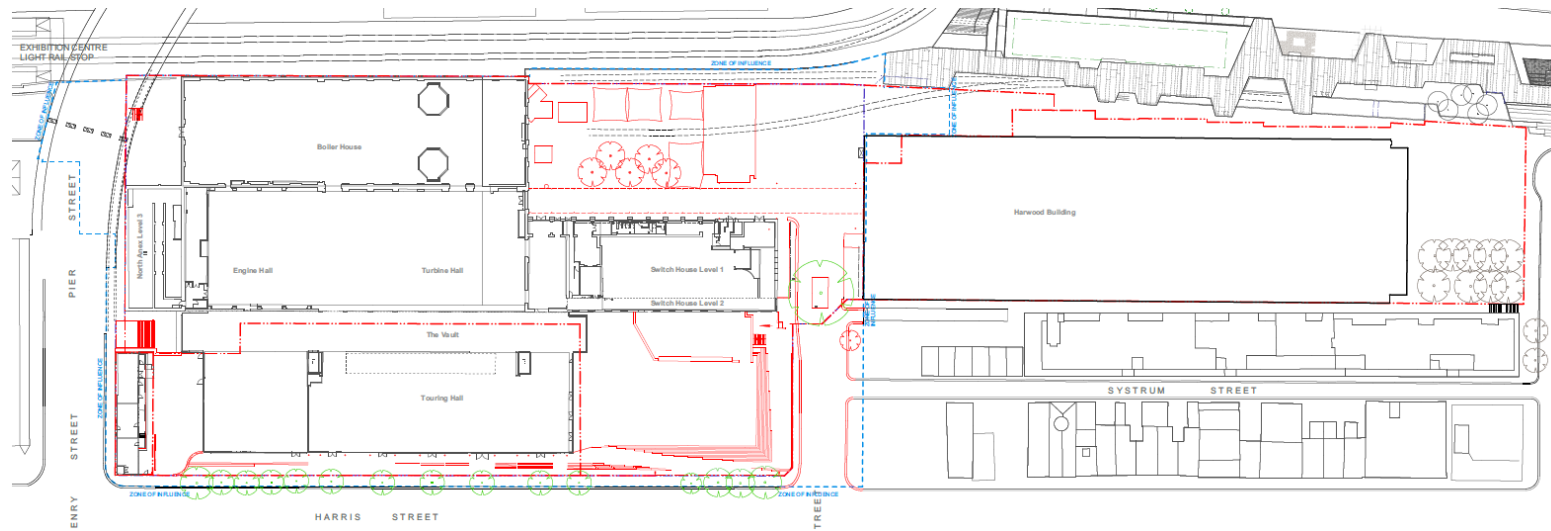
Powerhouse Ultimo Renewal- Landscape Demolition Plan LA-051 Rev B (Aspect Studios 2022)
